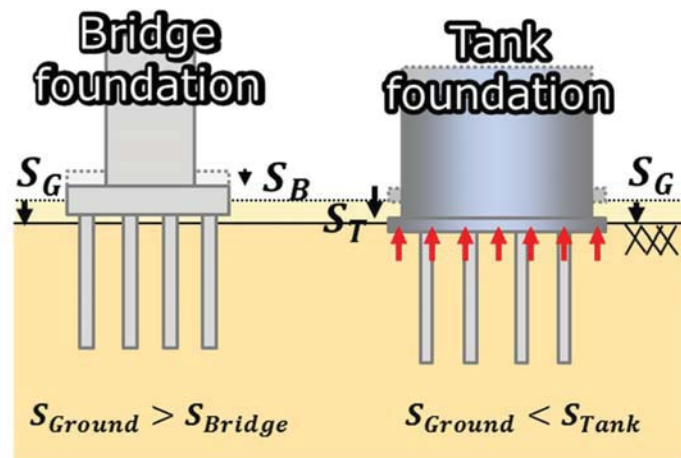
Comparison of oil tank foundation and bridge foundation.
